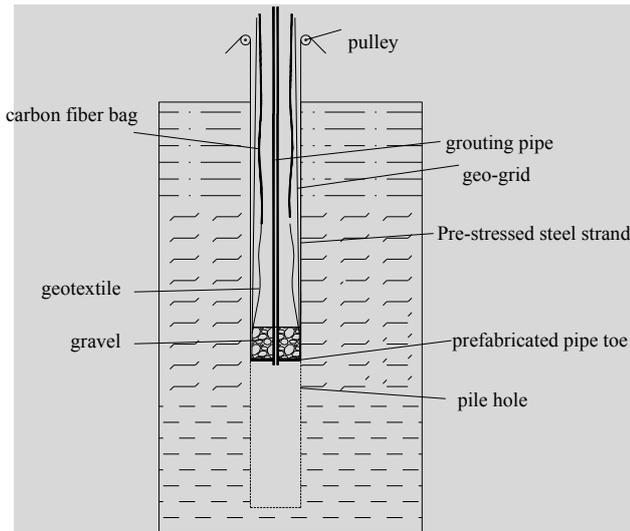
Pre-drilling embedded geotextile gravel grouting pile construction method
